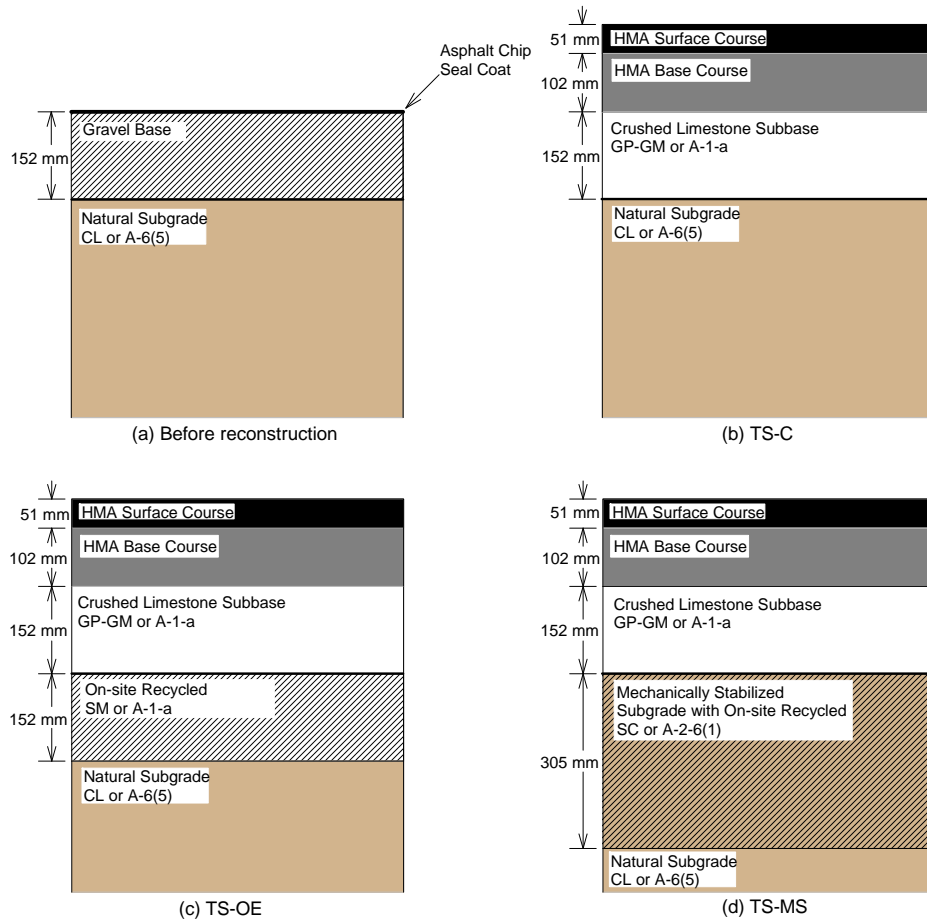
Pavement cross sections showing (a) pavement conditions before reconstruction; (b) TS-C; (c) TS-OE; and (d) TS-MS.
